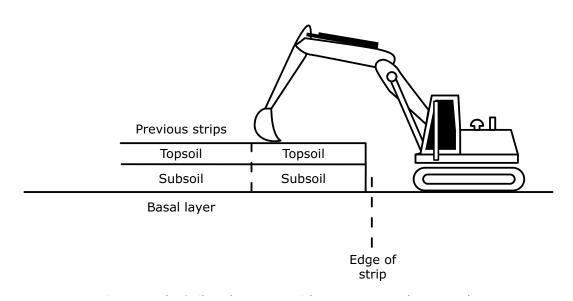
Soil replacement with excavators - dump trucks: Topsoil layer.
